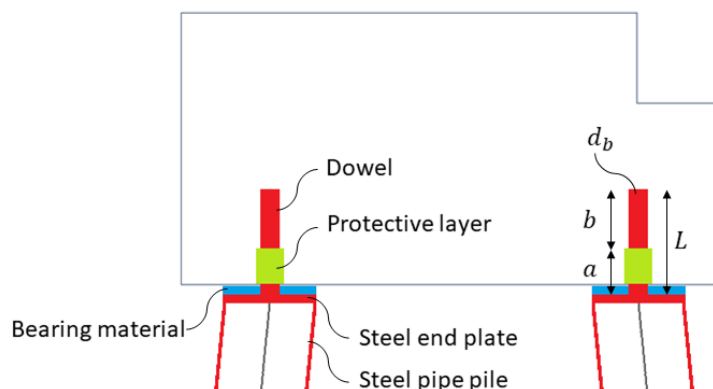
Impression of investigated demountable dowel footing to foundation (F2F) connection
